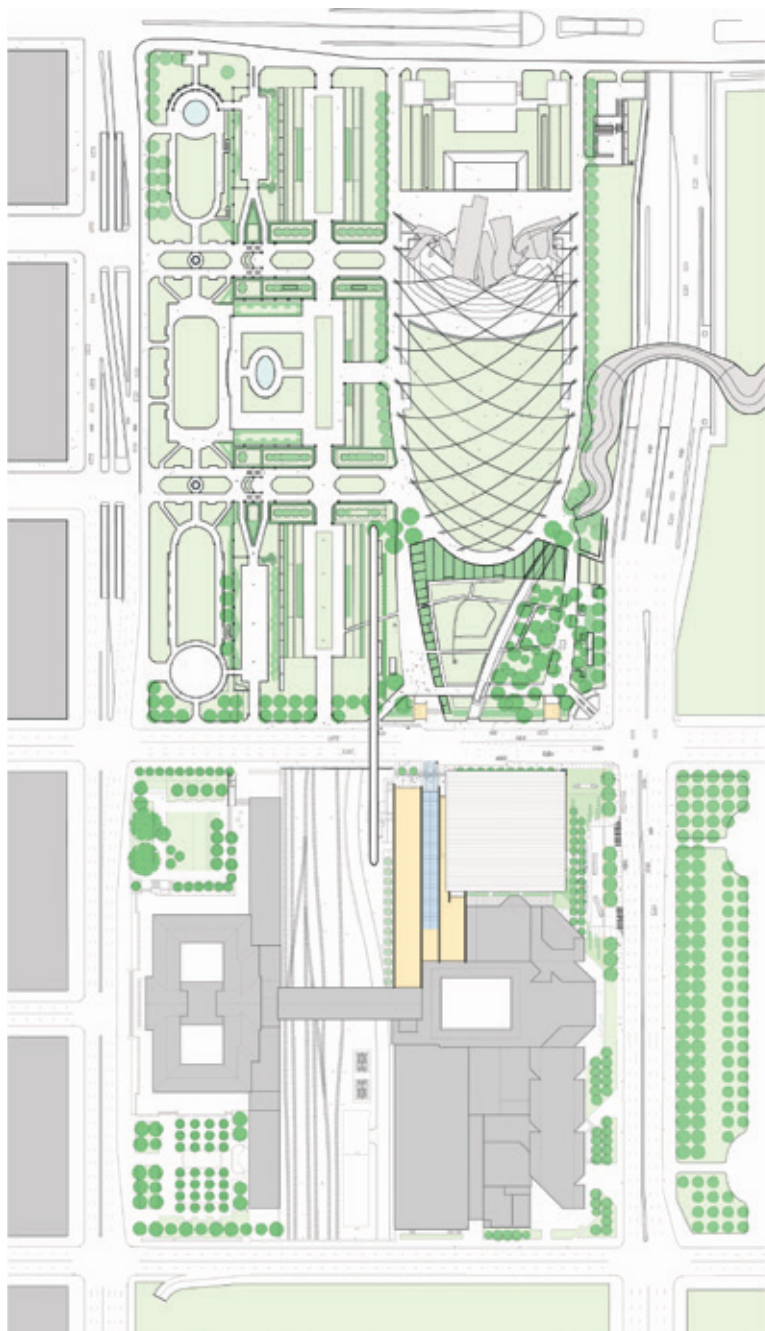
Site plan of Nichols Bridgeway showing how it links The Art Institute of Chicago with Millennium Park
